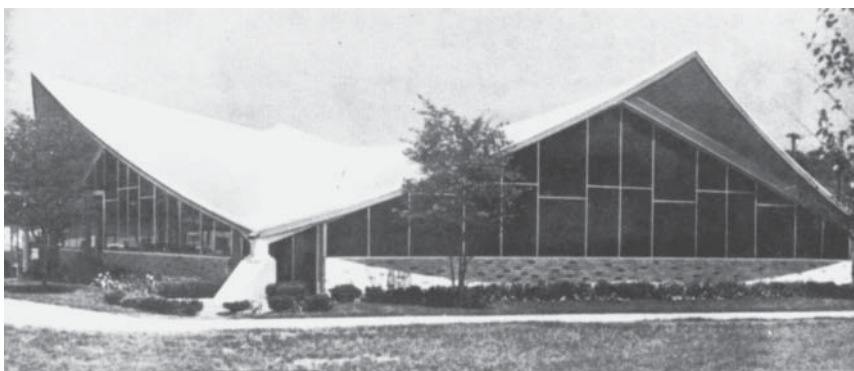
Hyperbolic paraboloid roof of welded laminated steel deck. Reprinted from *Architectural Record*, March 1962. Copyright by McGraw-Hill Book Co., Inc.^{1.79}
